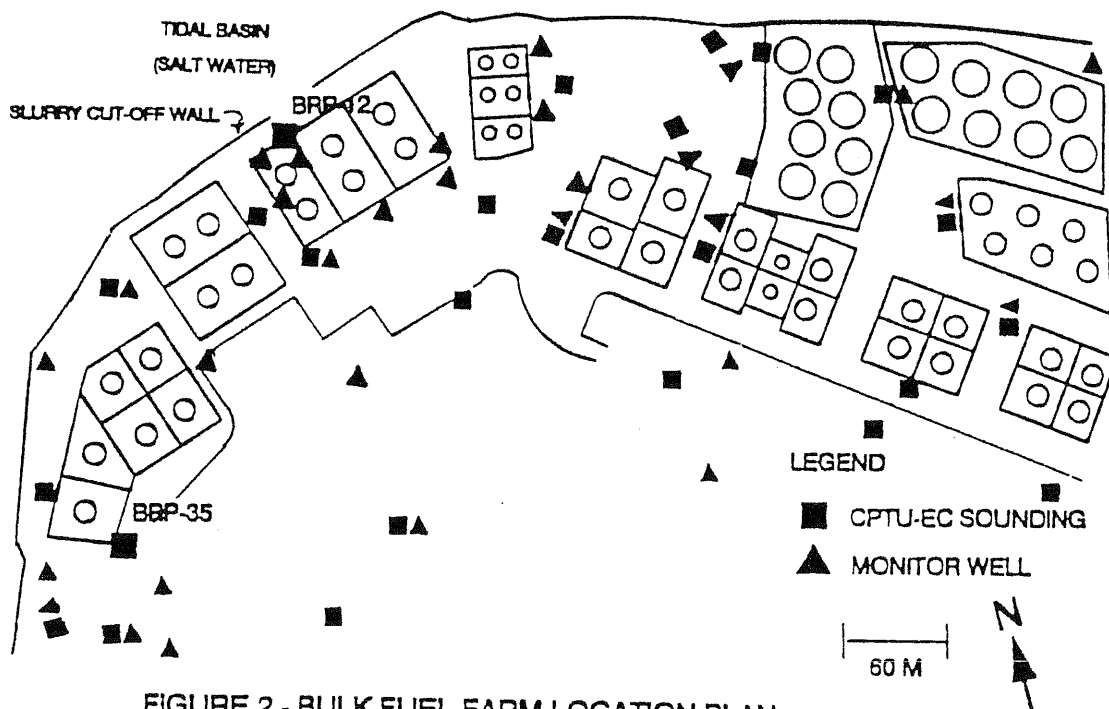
BULK FUEL FARM LOCATION PLAN
